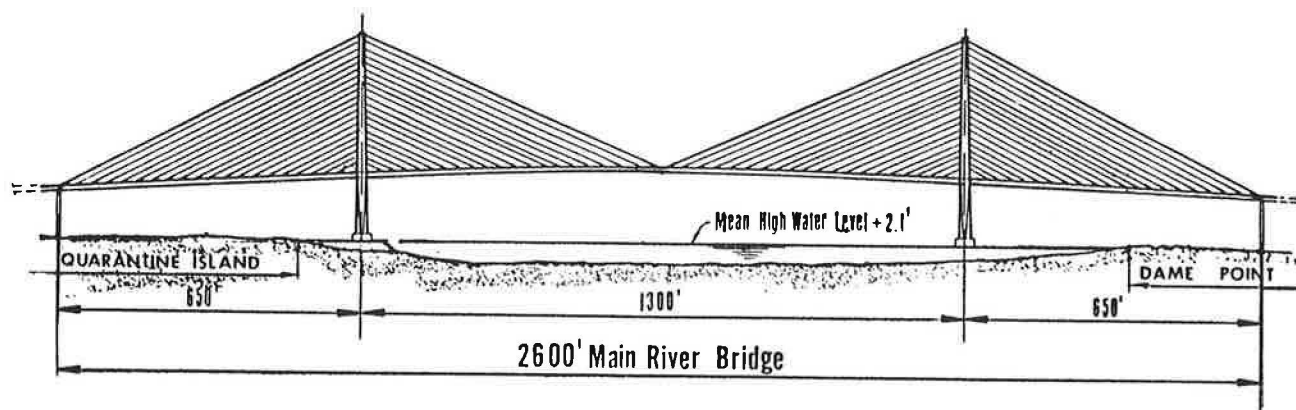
ELEVATION OF THE DAME POINT BRIDGE
